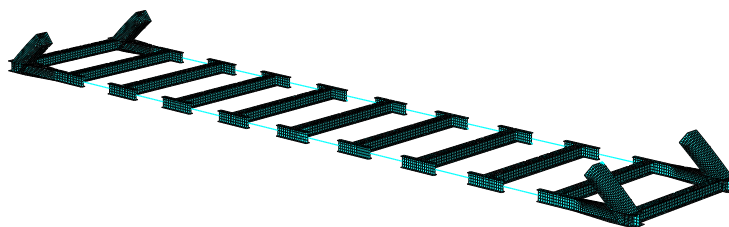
A part of the longitudinal beam was modelled with shell elements and a part was modelled with beam elements. A part of the arch was also modelled with shell elements.
